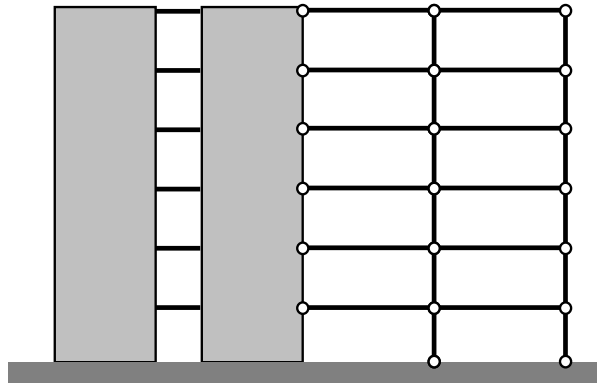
Example of conventional hybrid coupled shear wall system connected to a gravity-resisting steel frame with pinned beam-to-column joints.
